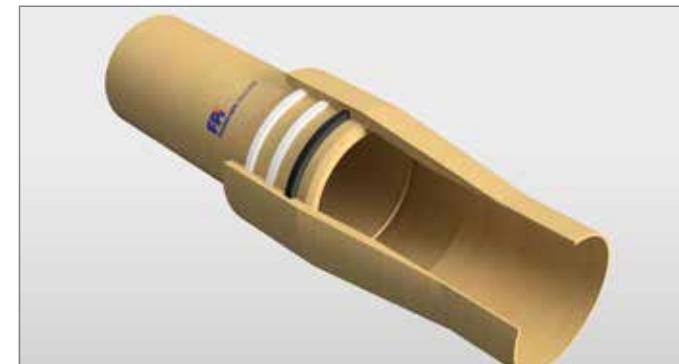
A Mechanical REKA ring lock joint with two keys
